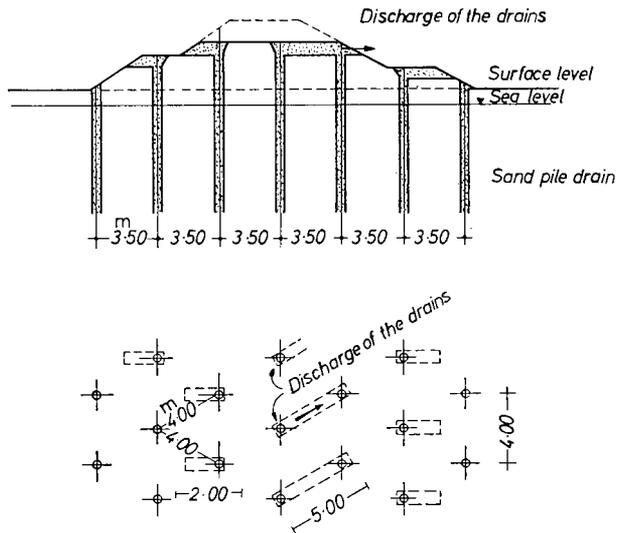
Arrangement for the discharge of water when the drains have been built in partially constructed levee
